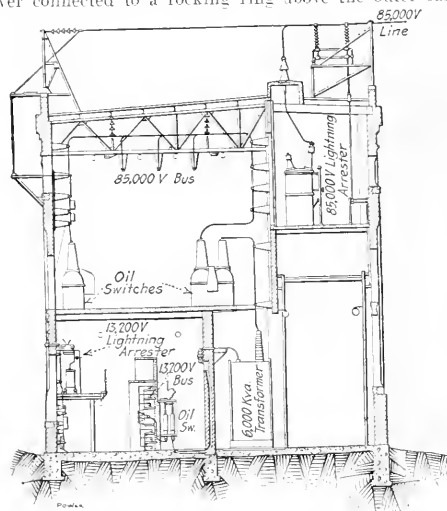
CROSS-SECTION THROUGH STEP-UP TRANSFORMER HOUSE
